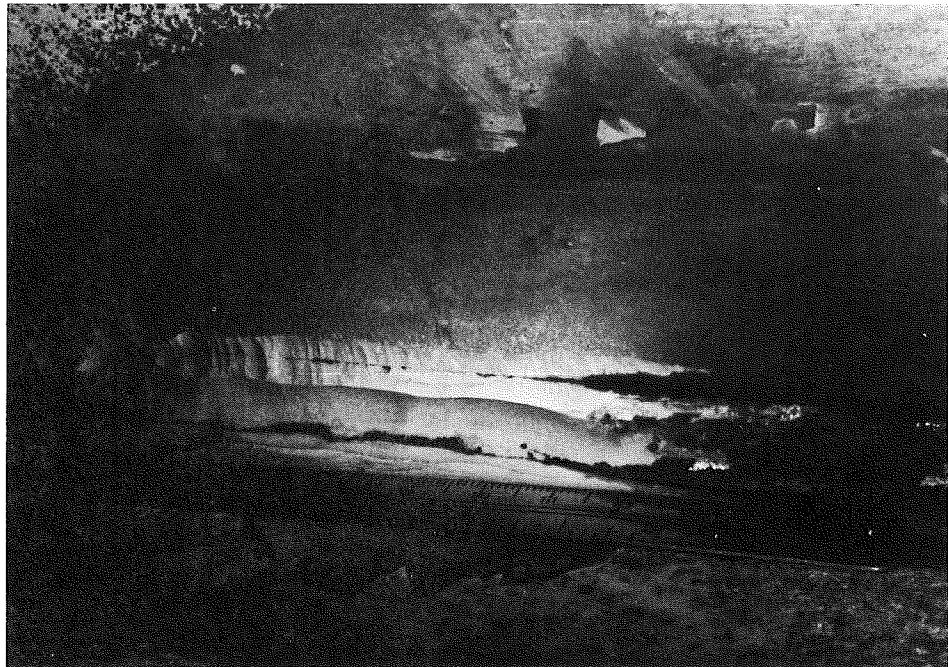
Cracks Can Be Seen in Web Plate at "Weld Toe"
